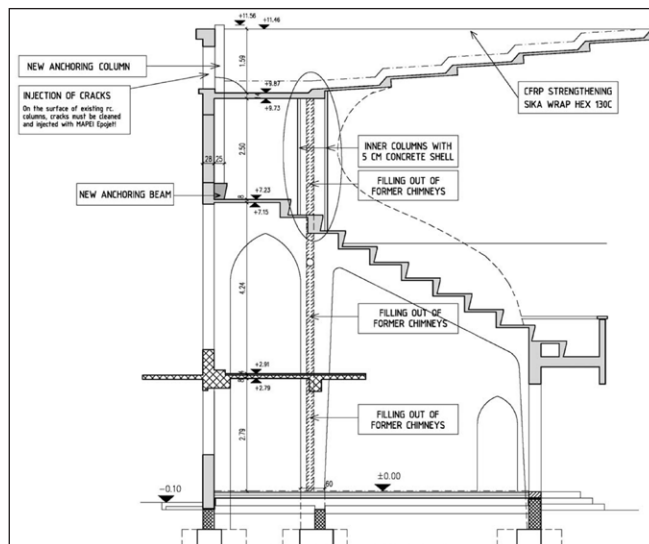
Strengthening plan of cantilever structure (CAEC Kft, 2003)
